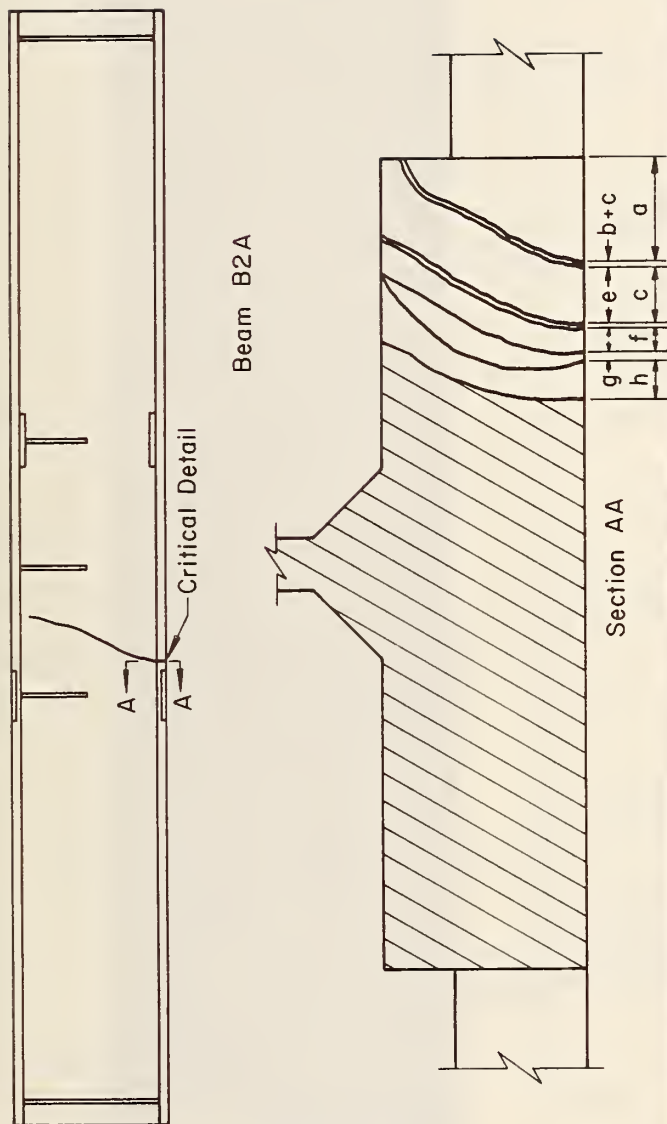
Fatigue and Fracture Surface, B2A (A514)
